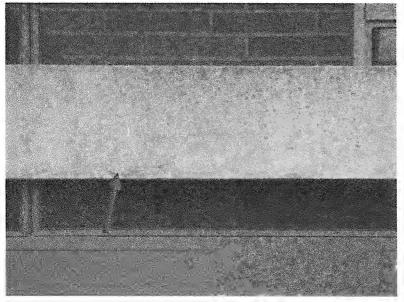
Incipient spall on balcony rail at west facade, third floor
